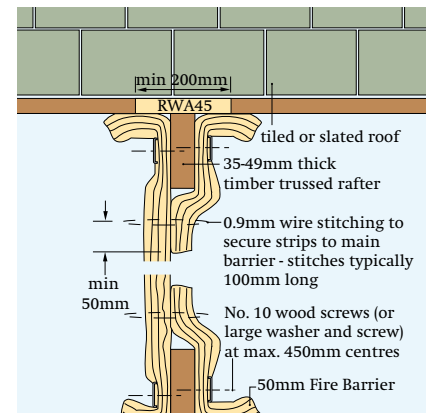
Half hour protection for timber truss construction 35 to 49mm thick
